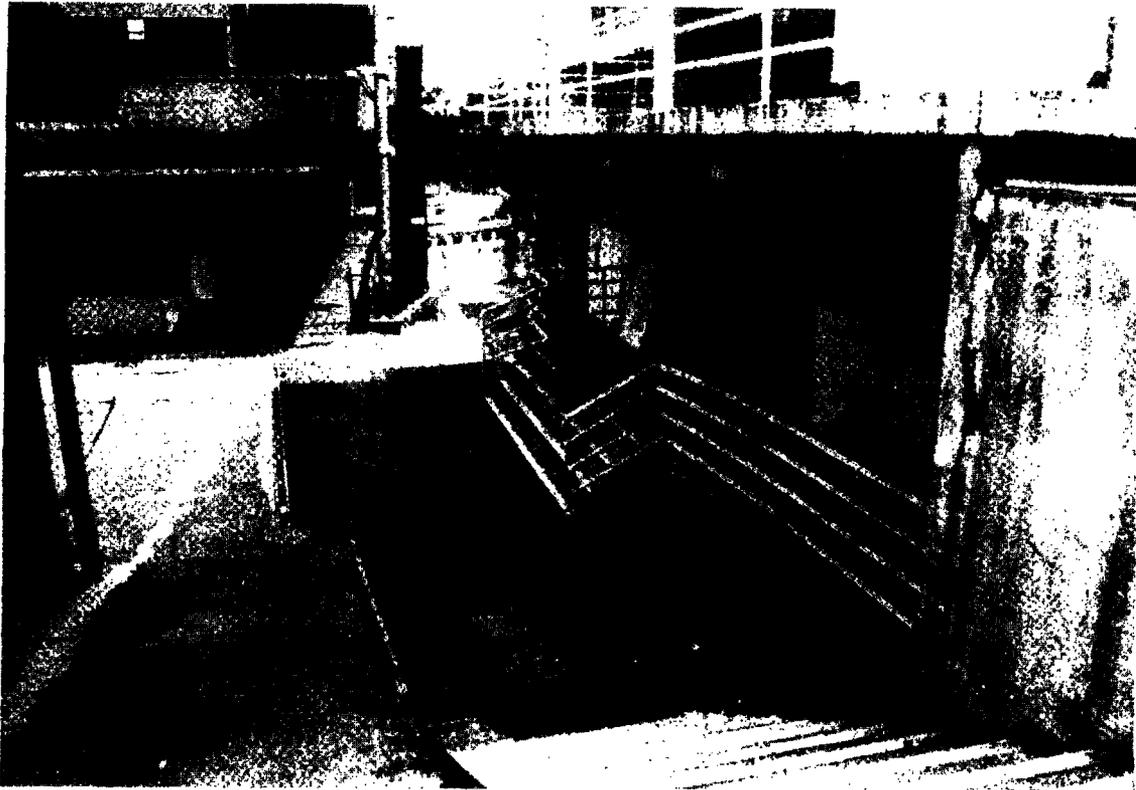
Tohoku Institute of Technology, walkway and north entrance of building 5 shows settlement of backfill along length of building.
